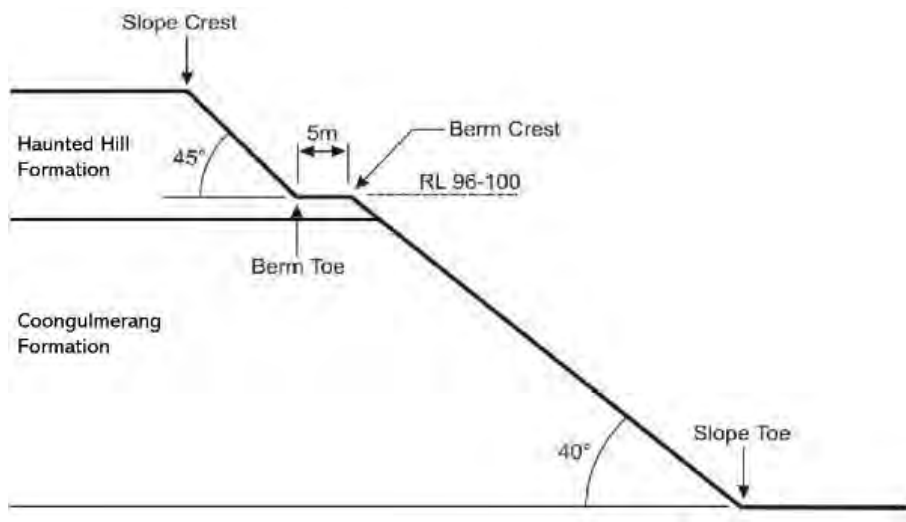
~~12112~~: Typical pit wall configuration in overburden
